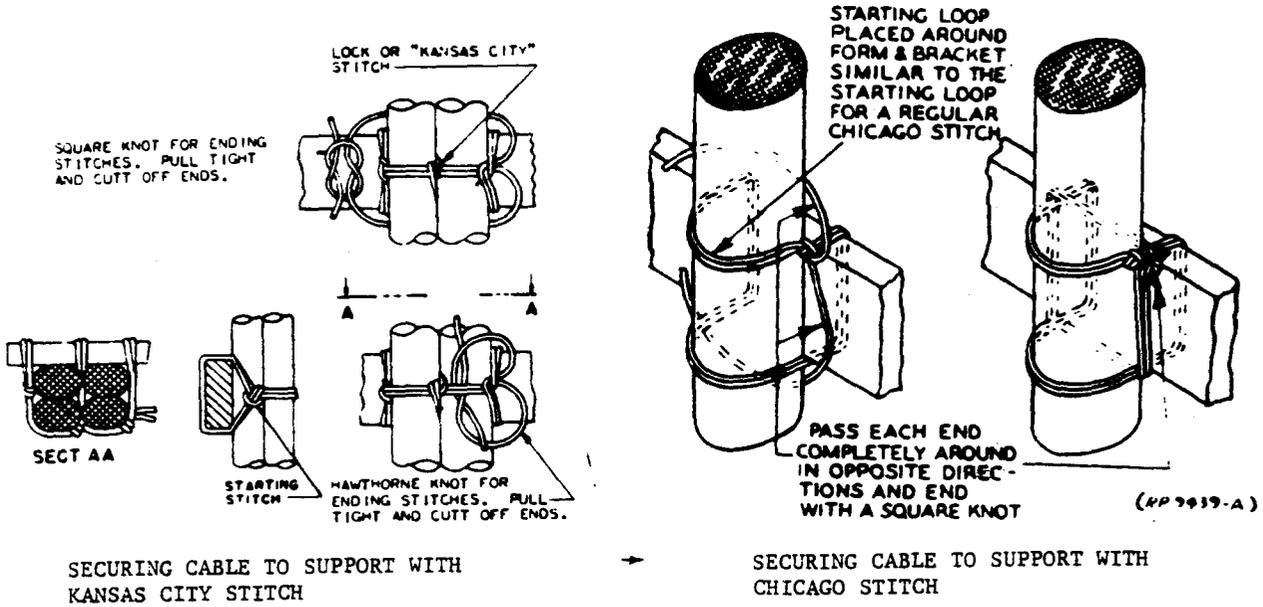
SEWING CABLES TO CABLE BRACKETS AND DISTRIBUTING FRAME TRANSVERSE ARMS (PAR. 5.211, 5.212, 5.213, 5.31, 5.43)
